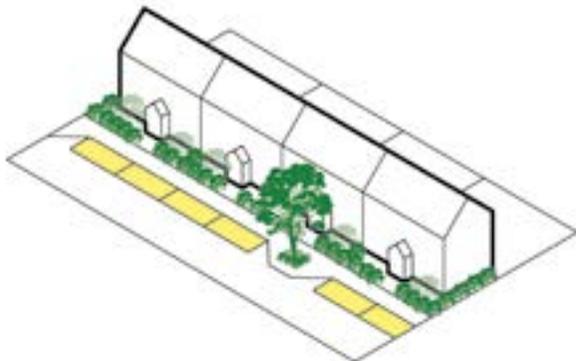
Illustrative diagram showing an indicative layout of on-street parking.
